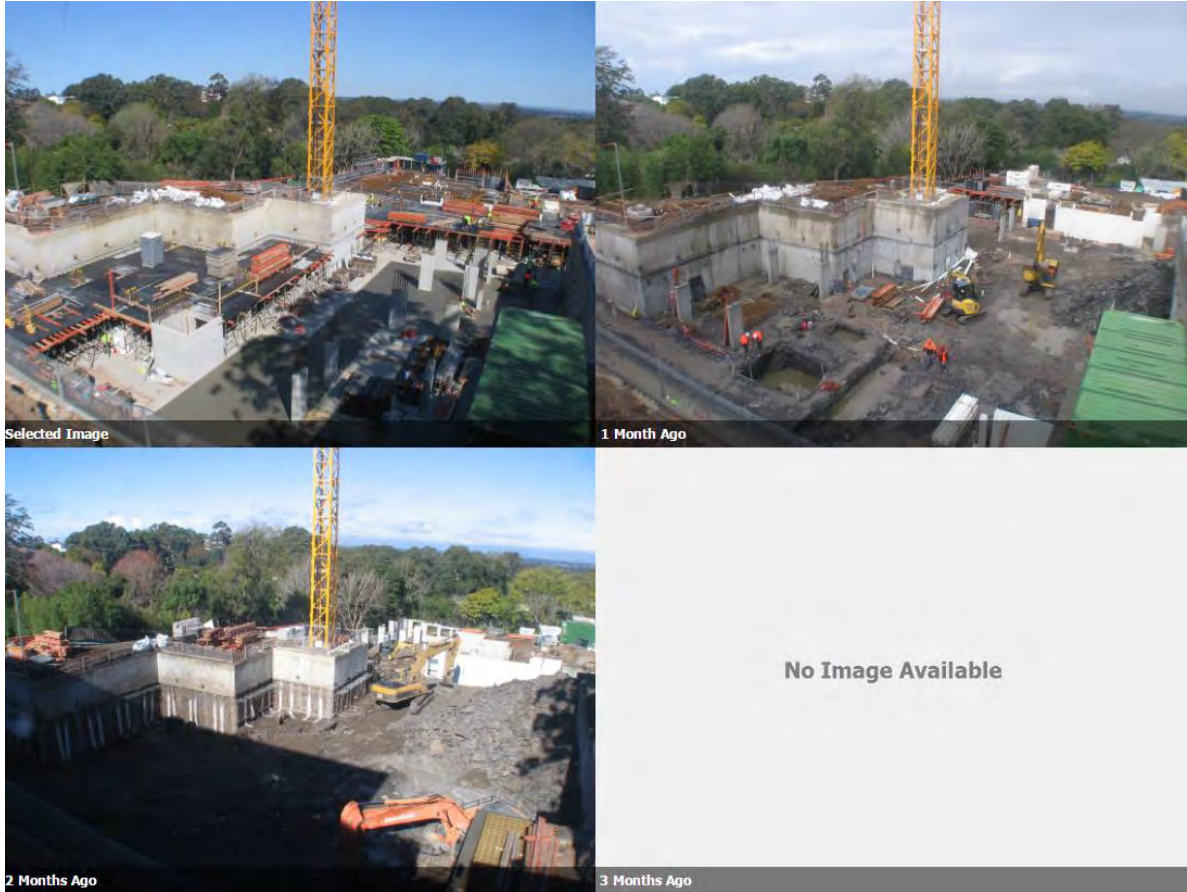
The picture below from the 5th of September shows some of the formwork complete for building A and footings for building B complete.
